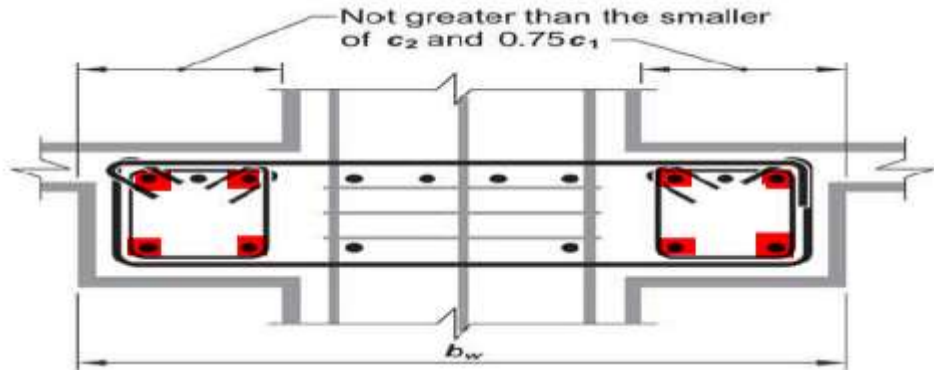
Maximum effective width of wide beam and required transverse reinforcement.
